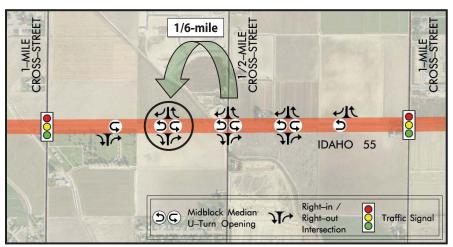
Urban/suburban median U-turn opening spacing – 10<sup>th</sup> Avenue to Middleton Road
